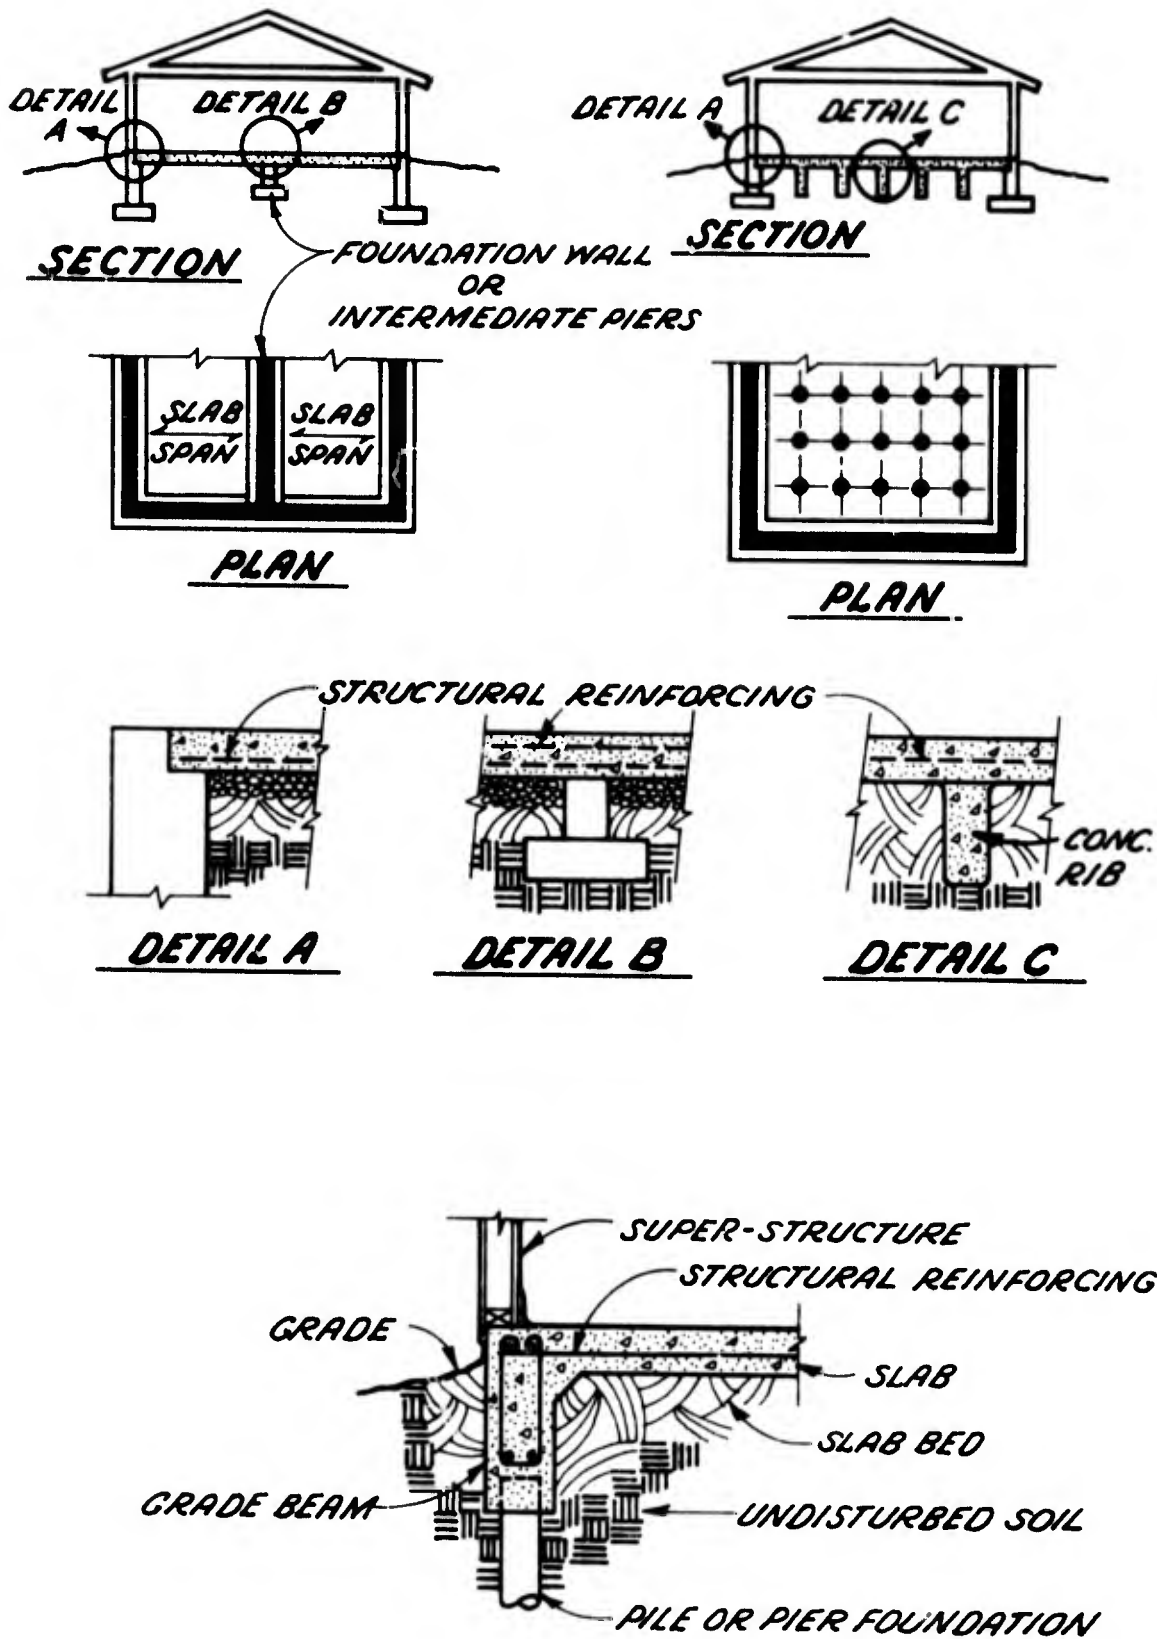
Type IV slab-on-ground. Typical construction details shown. Note that the use of a pile or pier foundation may be optional.
